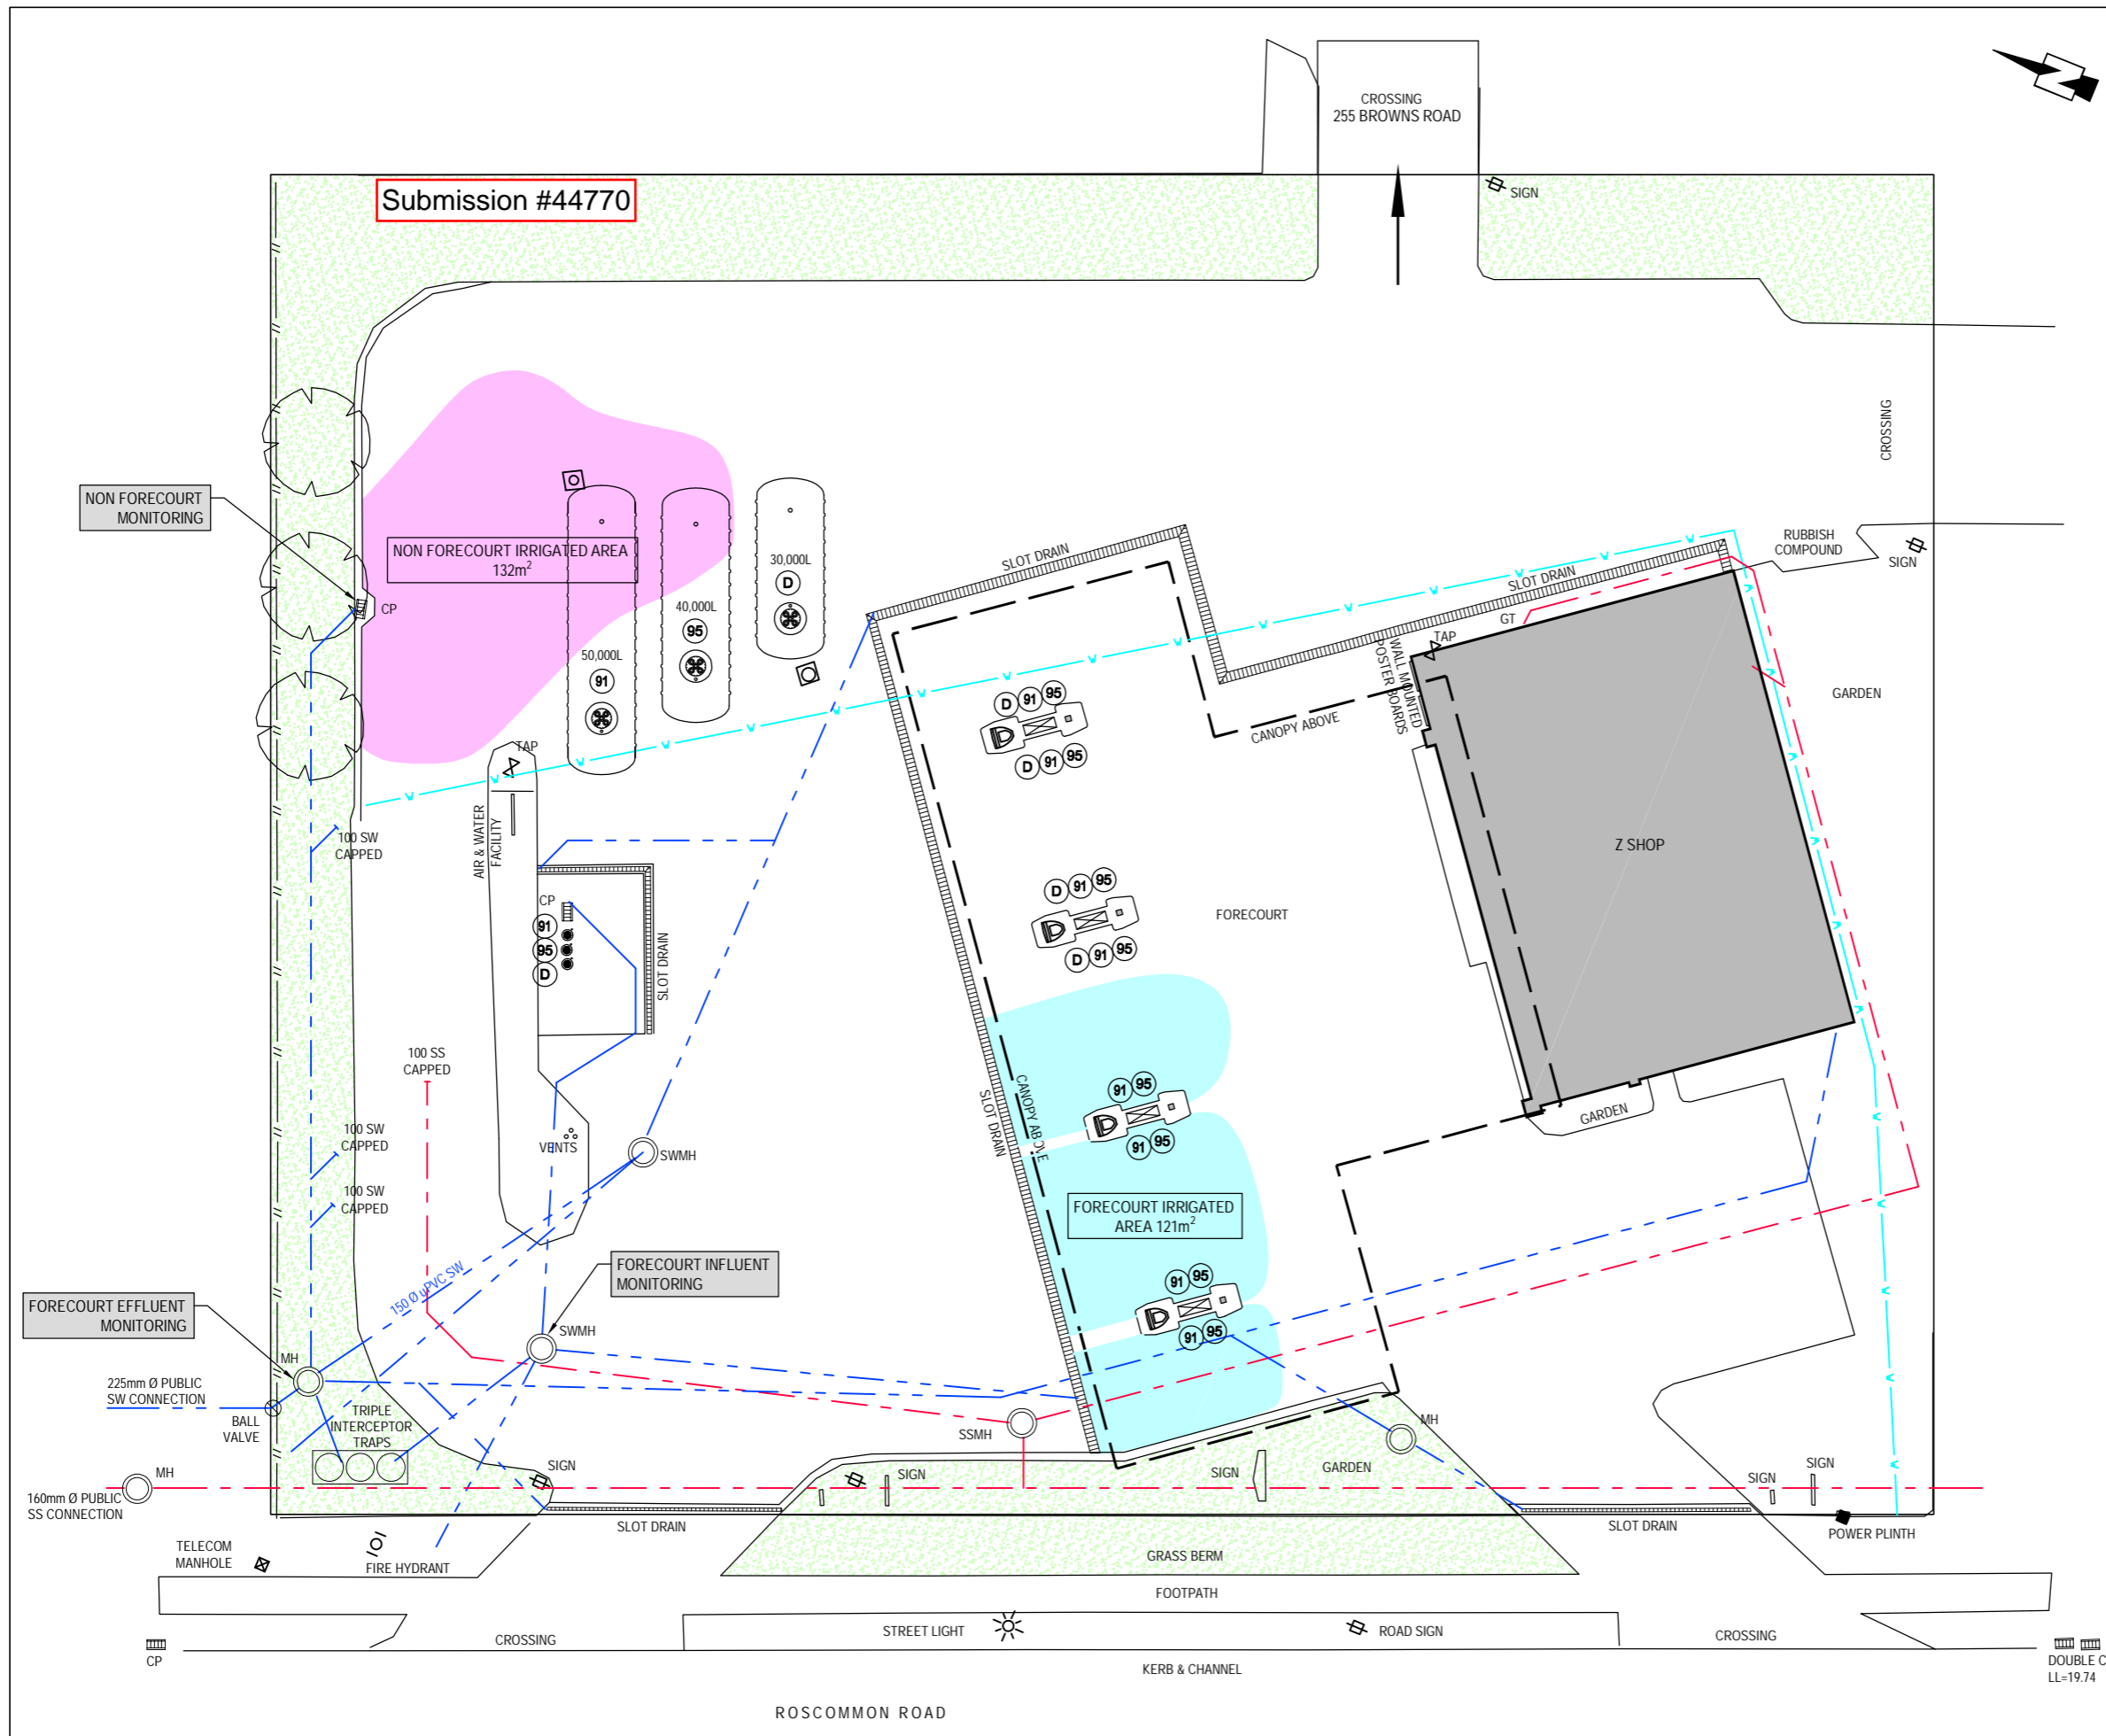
SITE PLAN - HUNTERS CORNER
